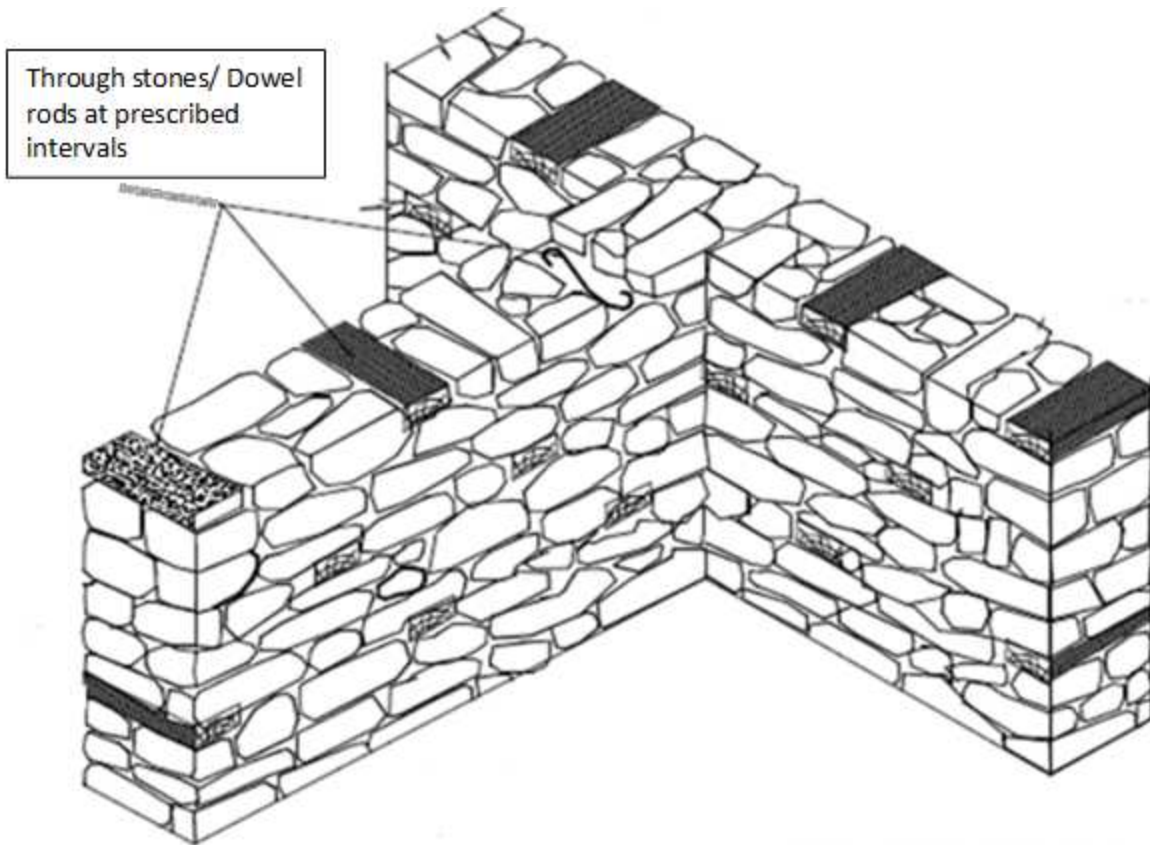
Details of stone wall masonry construction (from NBC 203, 2015)
